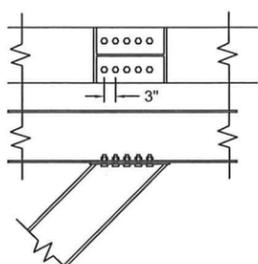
PLATE DIMENSIONS, 0.8" THICK AT ANGLE BRACE
